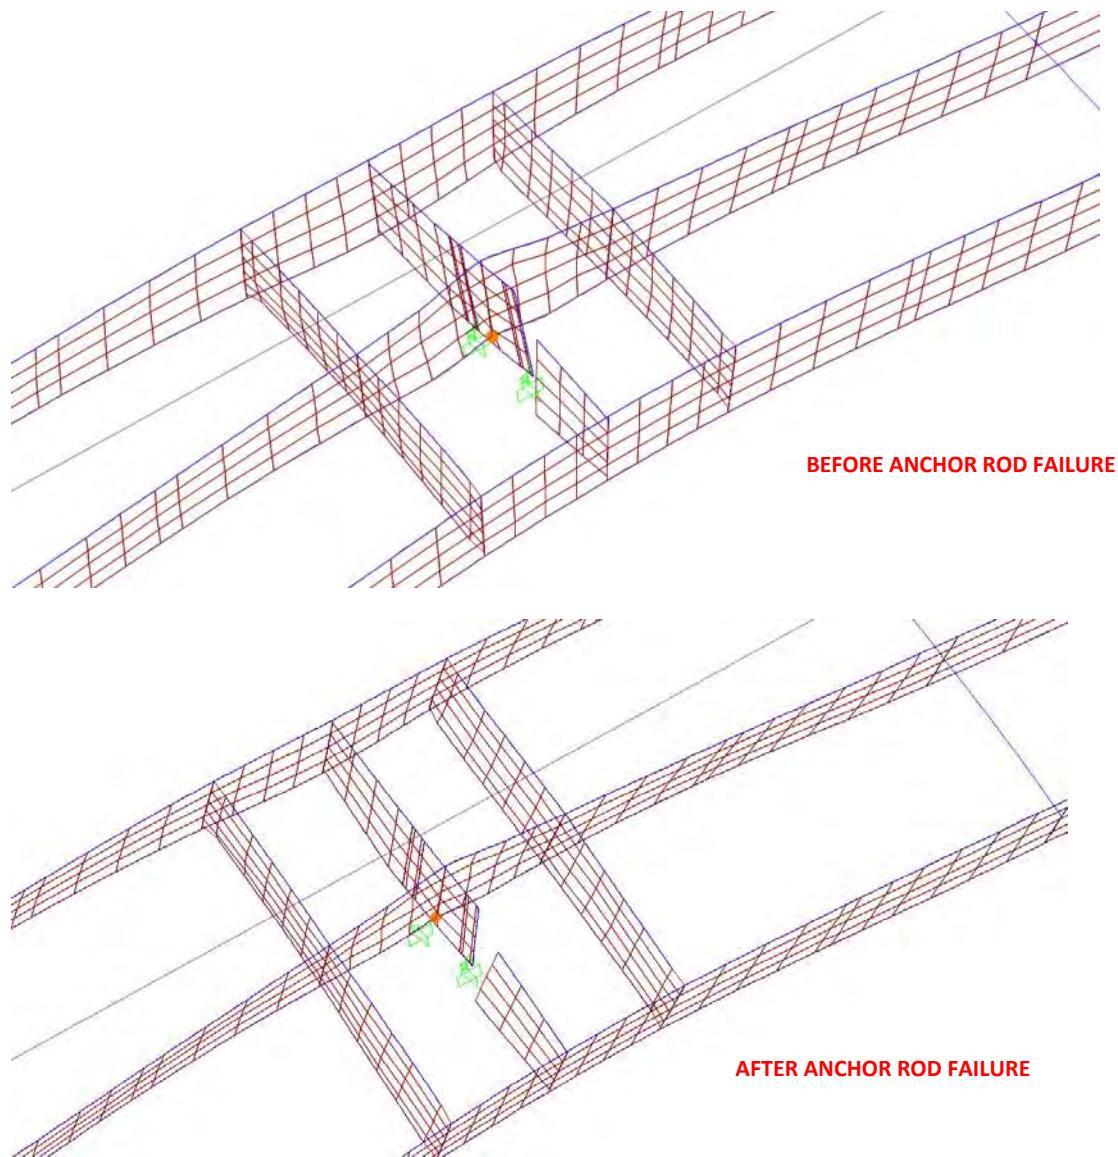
Independent Model Before and After Failure of Pier 2 Anchorage (Deck not shown for clarity)
